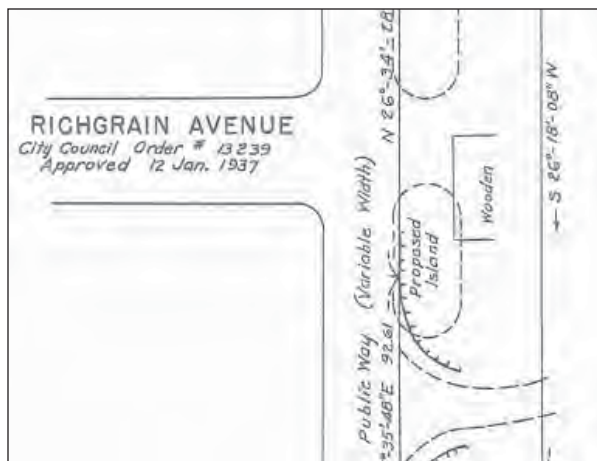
Detail of plan of proposed widening of Gore Street ca. 1967.
